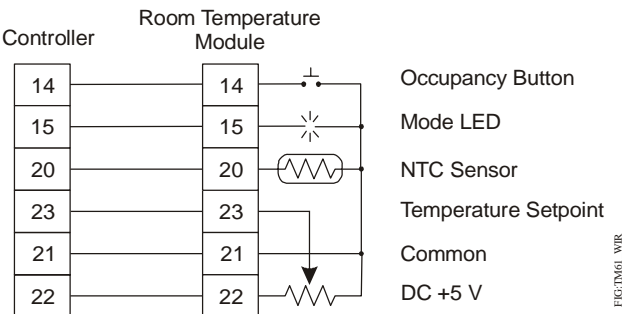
TM-1161-0000 and TM-1161-0005 Wirings
